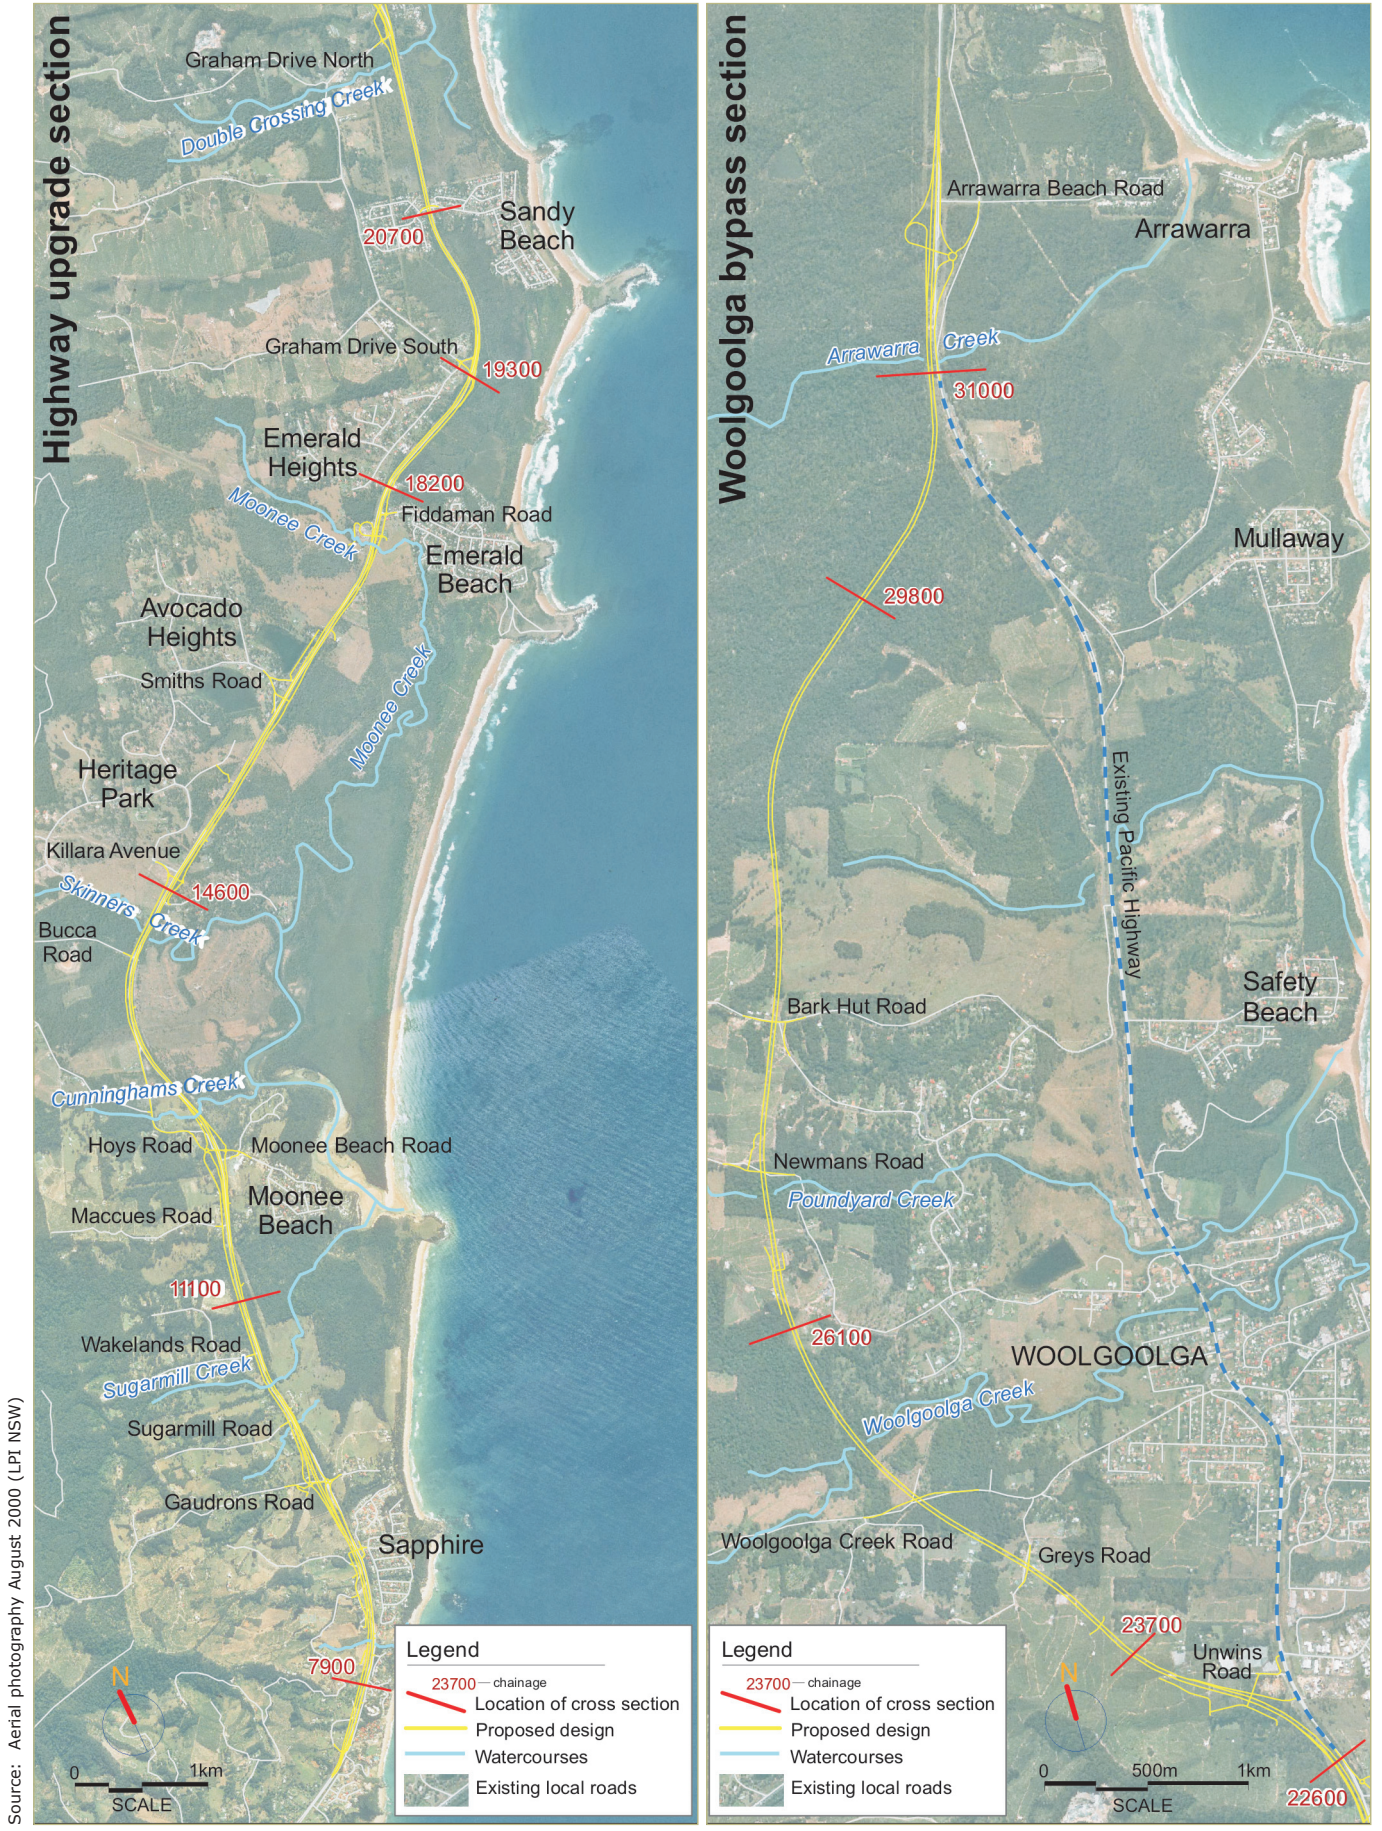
GENERAL LOCATION OF CROSS SECTIONS
